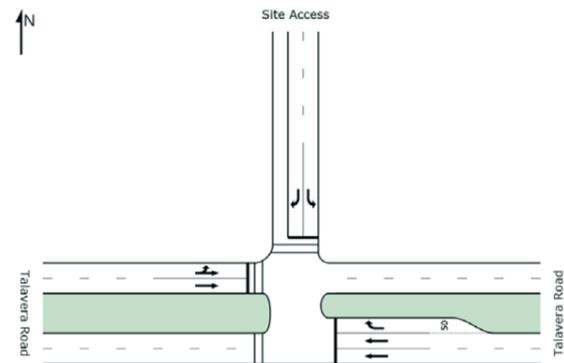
Eastern Site Access/ Talavera Road Intersection Configuration
